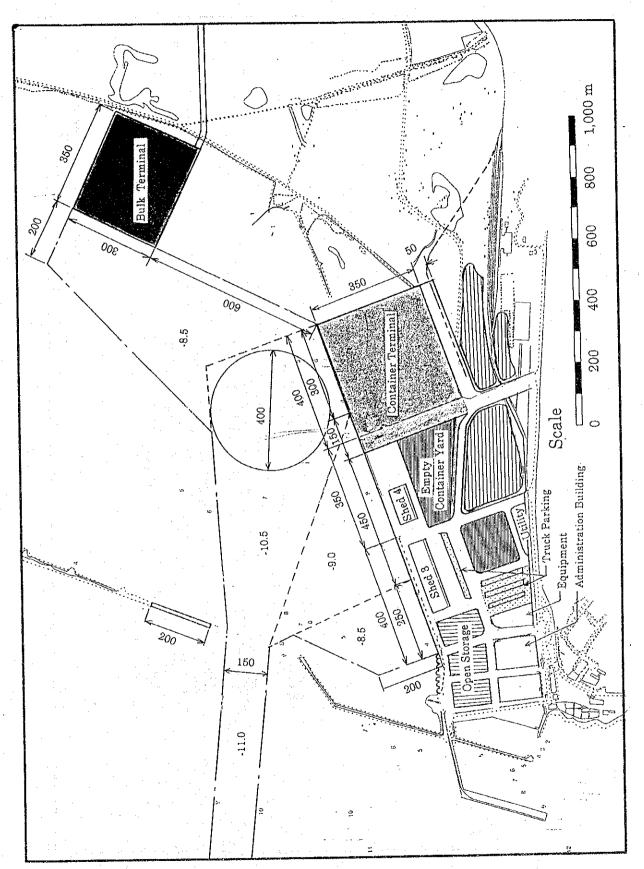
Long-term layout plan (2015, High and middle case), Plan-1 (H-1 and M-1)
